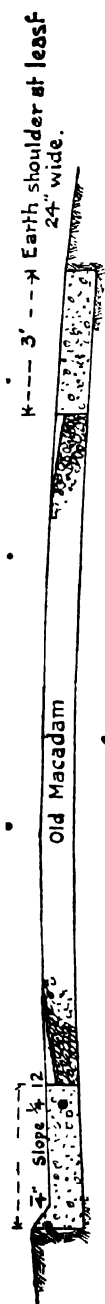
Typical Section of Macadam Road widened with Concrete Channels.
